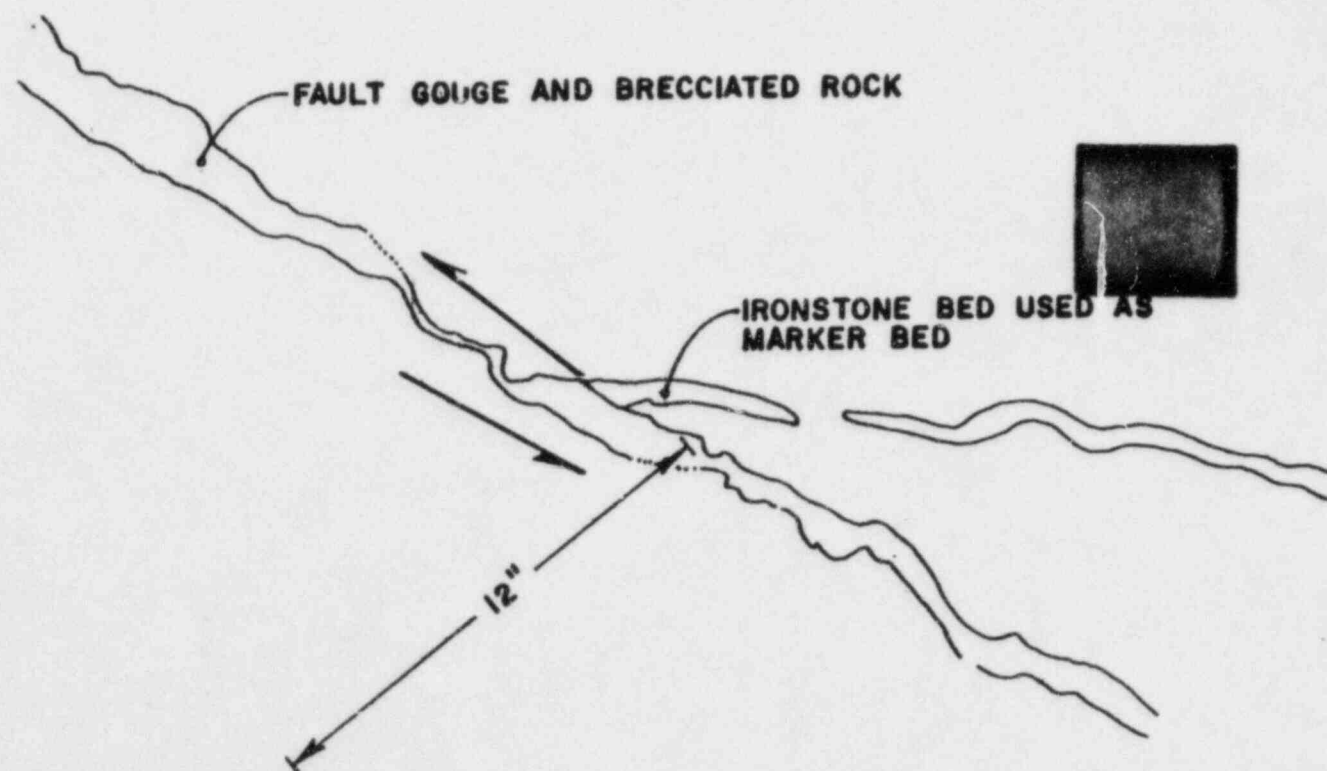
FAULT ON WEST WALL OF INTAKE TUNNEL.
